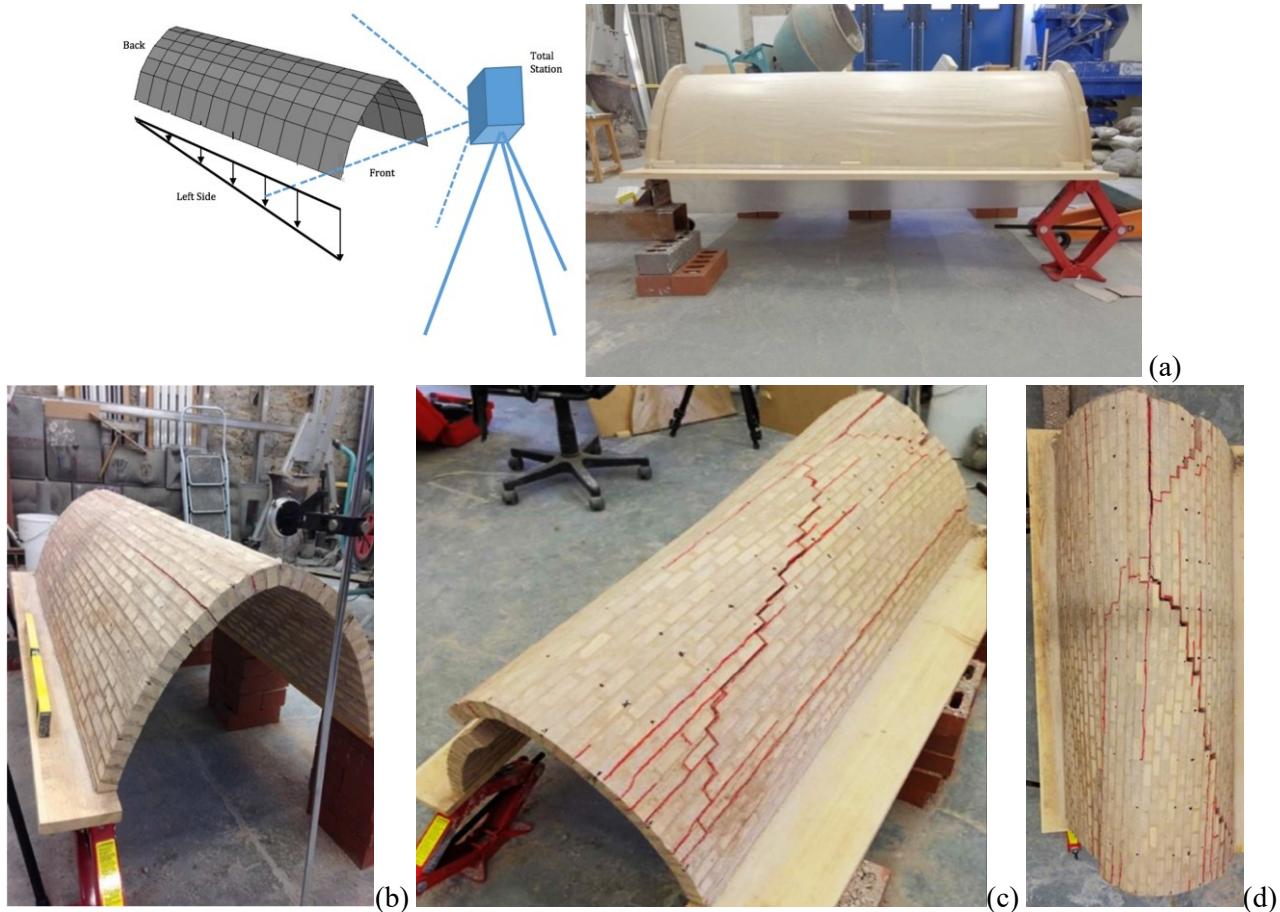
Experimental set-up (a) and cracks observed in the experiment: initial cracks (b) and crack pattern at the end of the test - corner view (c) and top view (d) [27].
